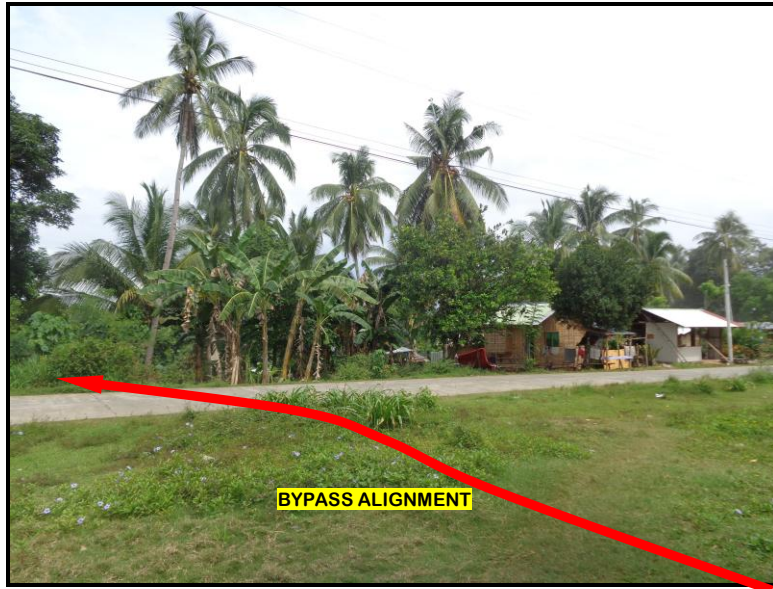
Bypass alignment crossing the Acacia-Ilang Road in Brgy. Tibungco at Sta. 31+000.
